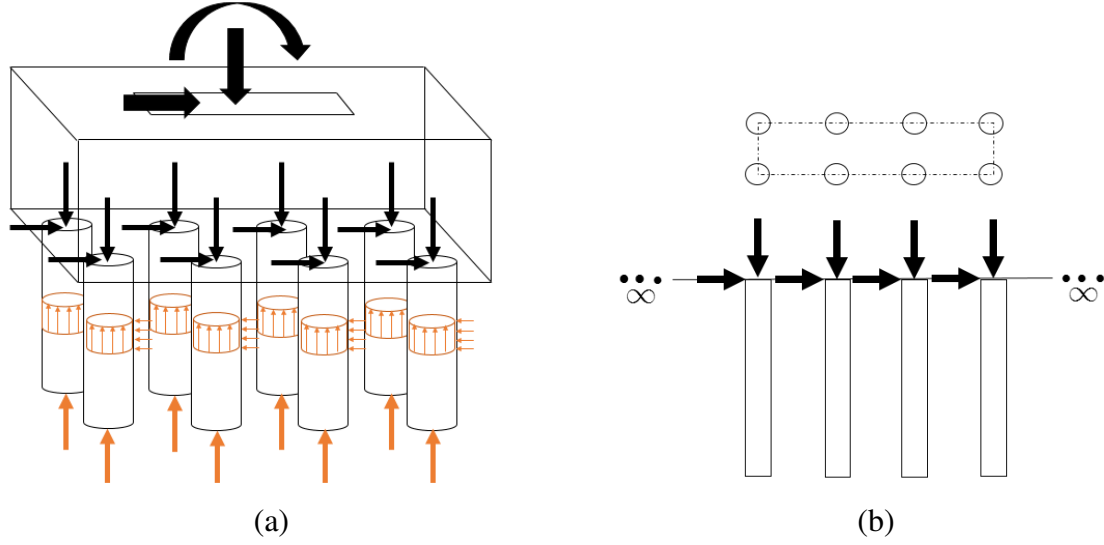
Load path from columns to piles (a). Foundation BEM-FEM model (b).
